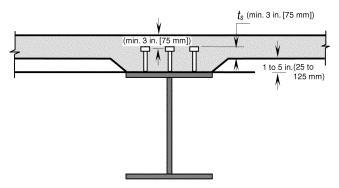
Haunch between the deck slab and top of the supporting beam.
